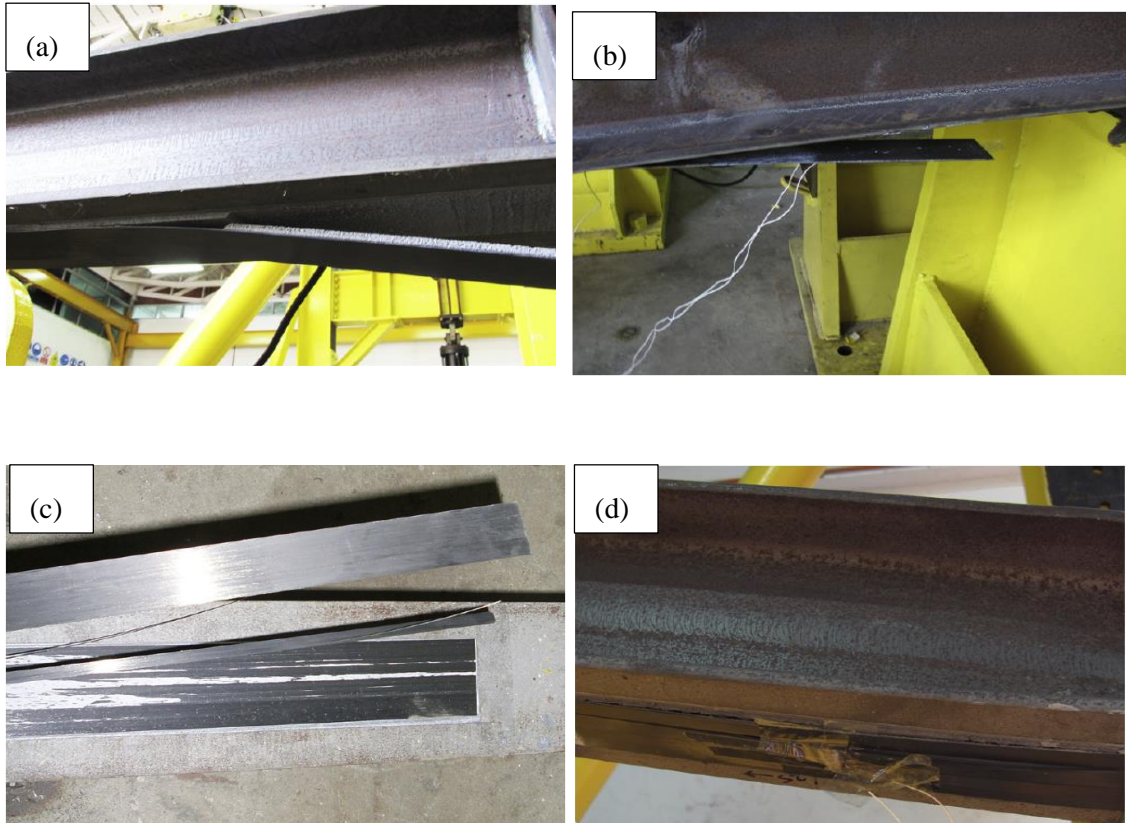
Failure modes of CFRP strengthened steel beams; (a) below point load debonding, (b) end debonding, (c) end delamination and (d) below point load splitting.
